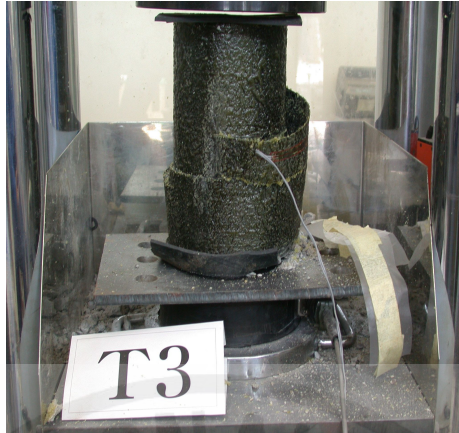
Test view of Concrete column confined by FRP Sheet
